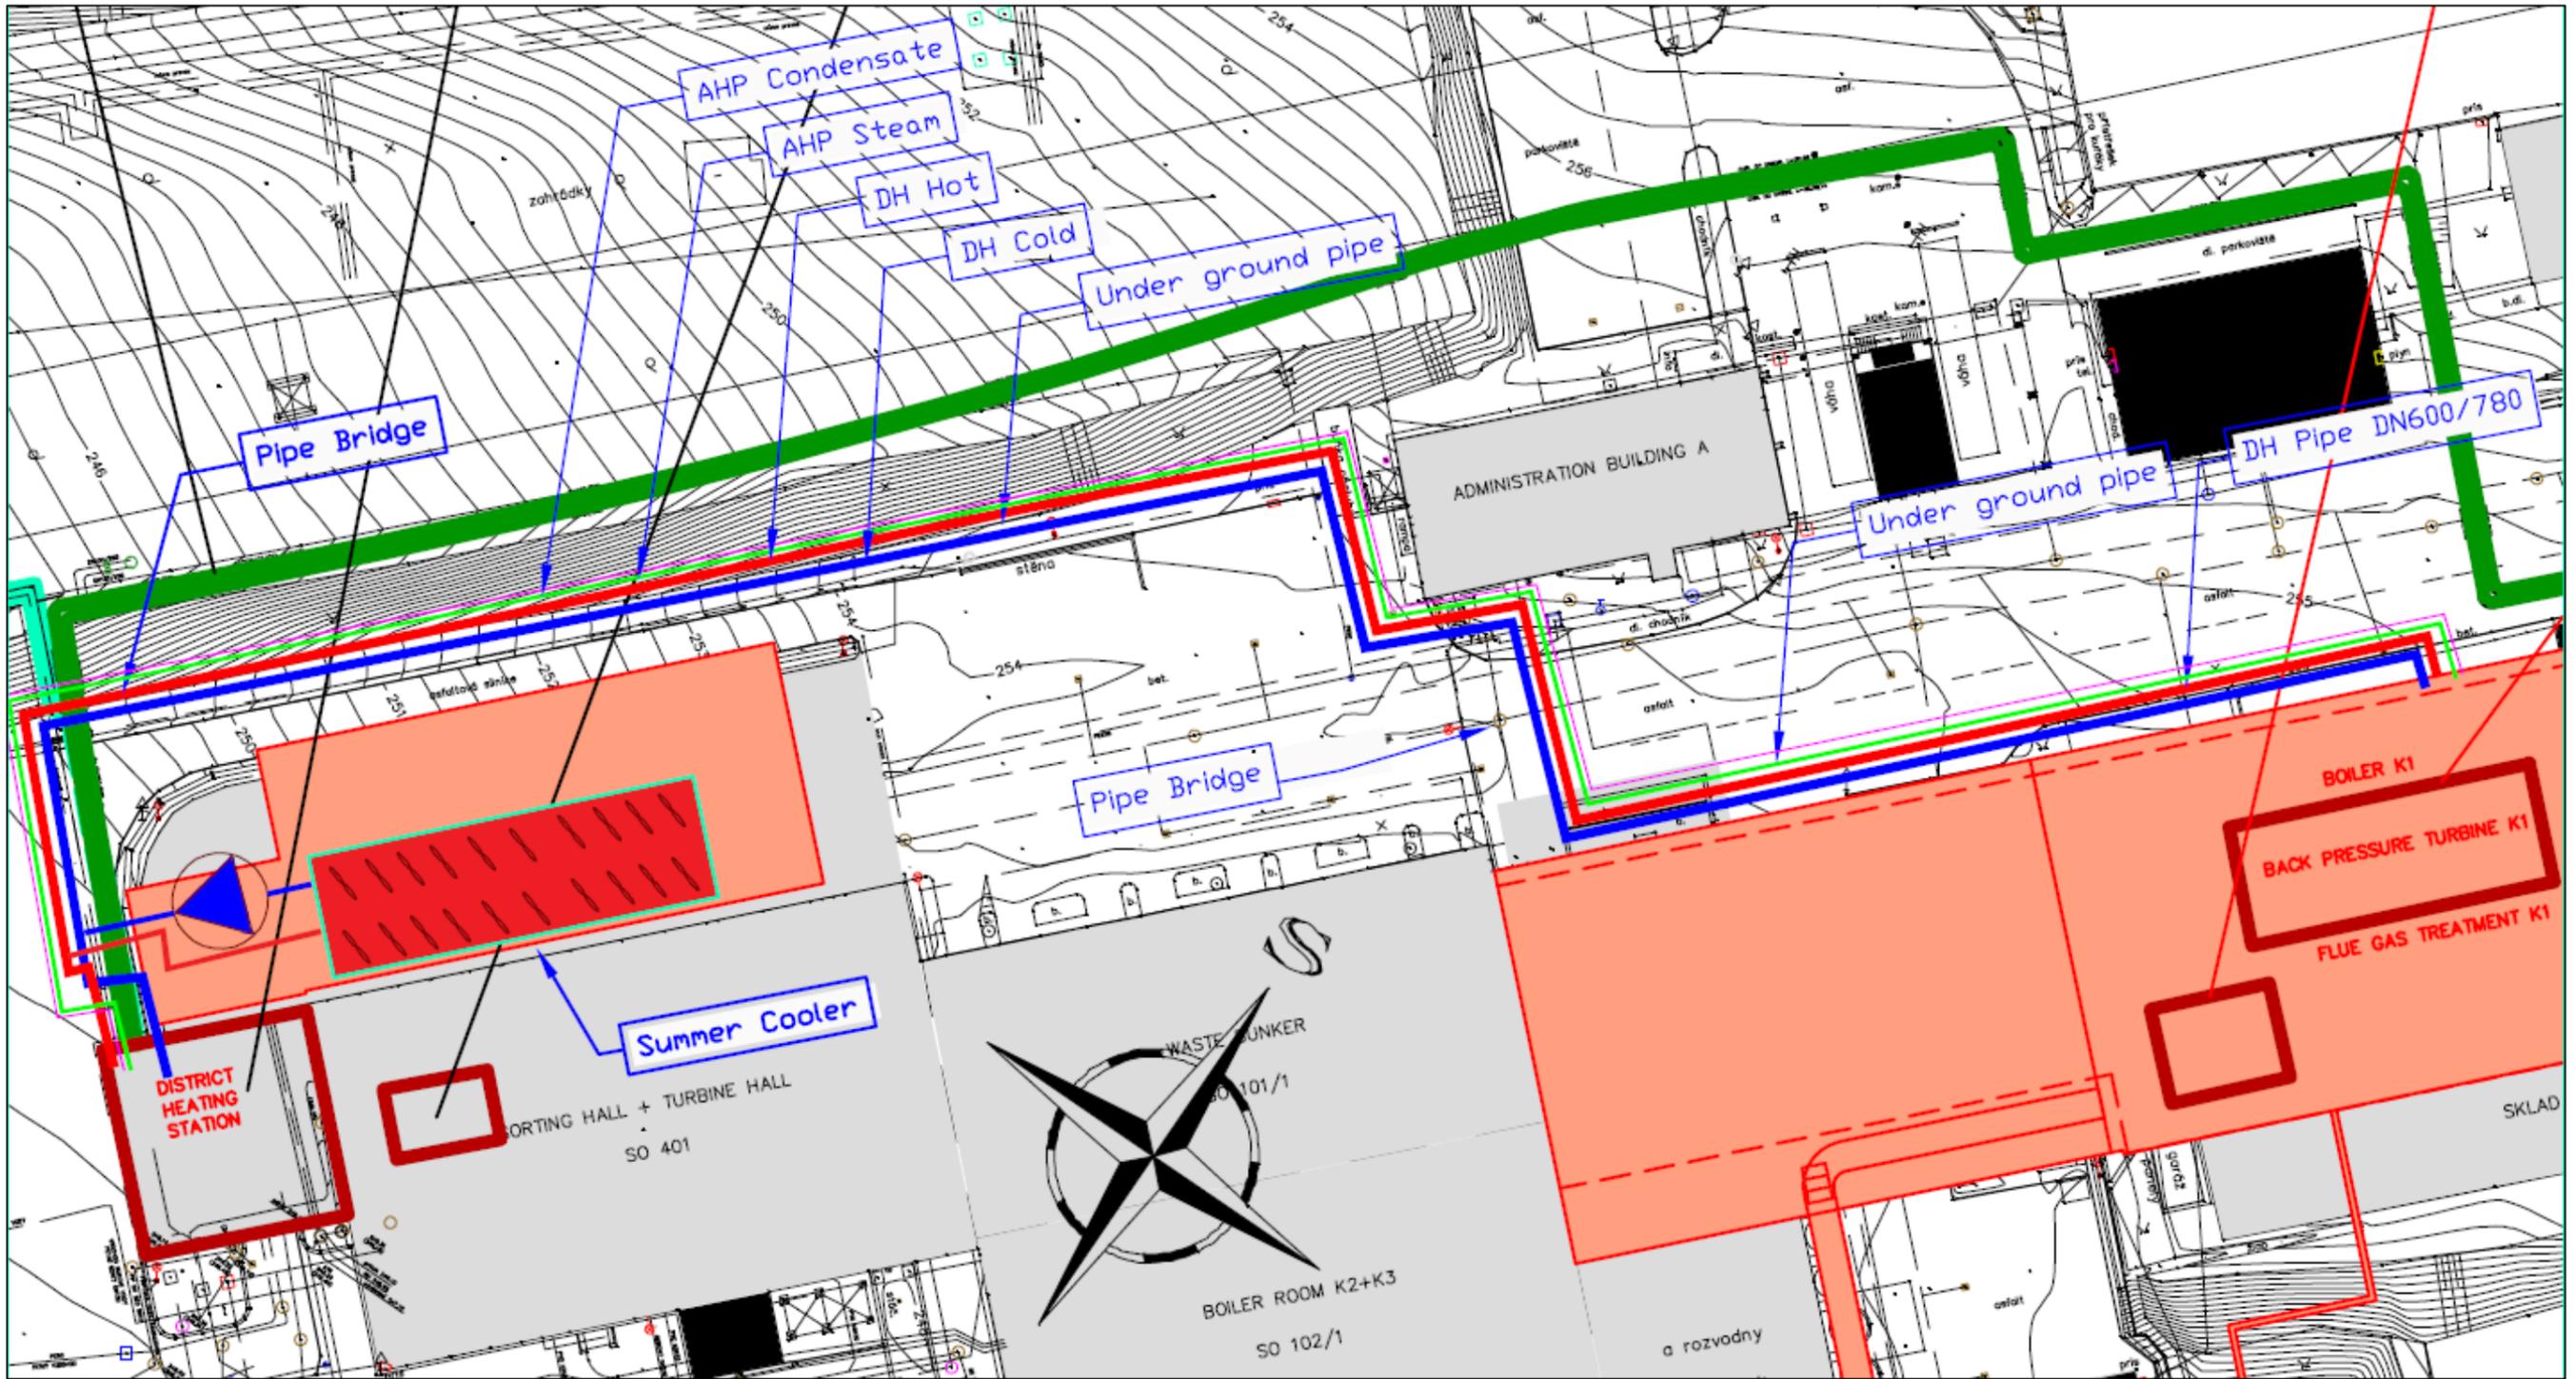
, Alternative A - Pipe routing between line K1 and existing DH building. "S" is towards the north
